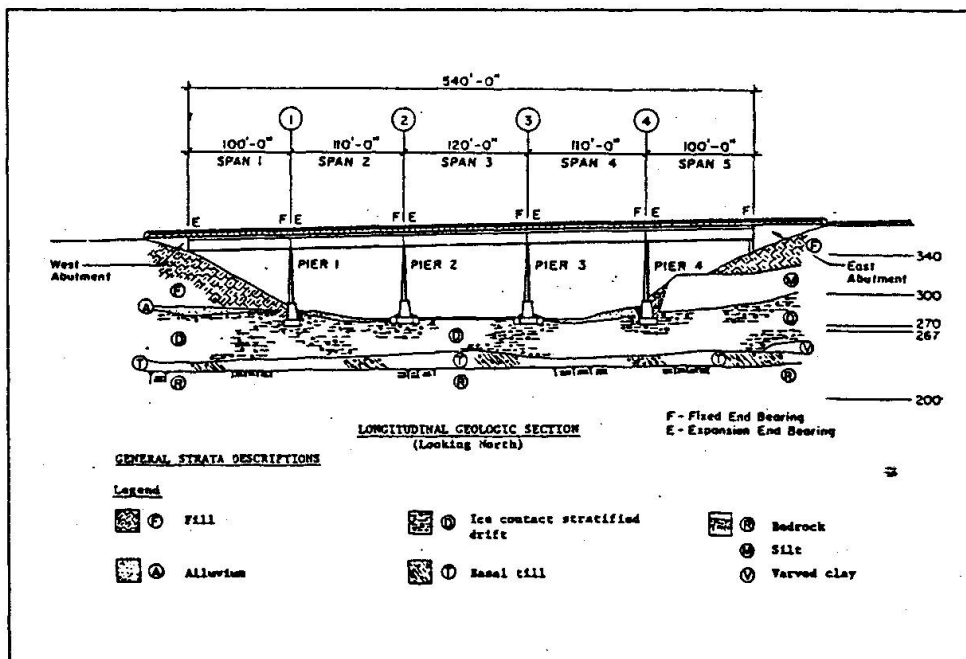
South elevation of Schoharie Creek bridge showing key structural features and schematic geological section.
